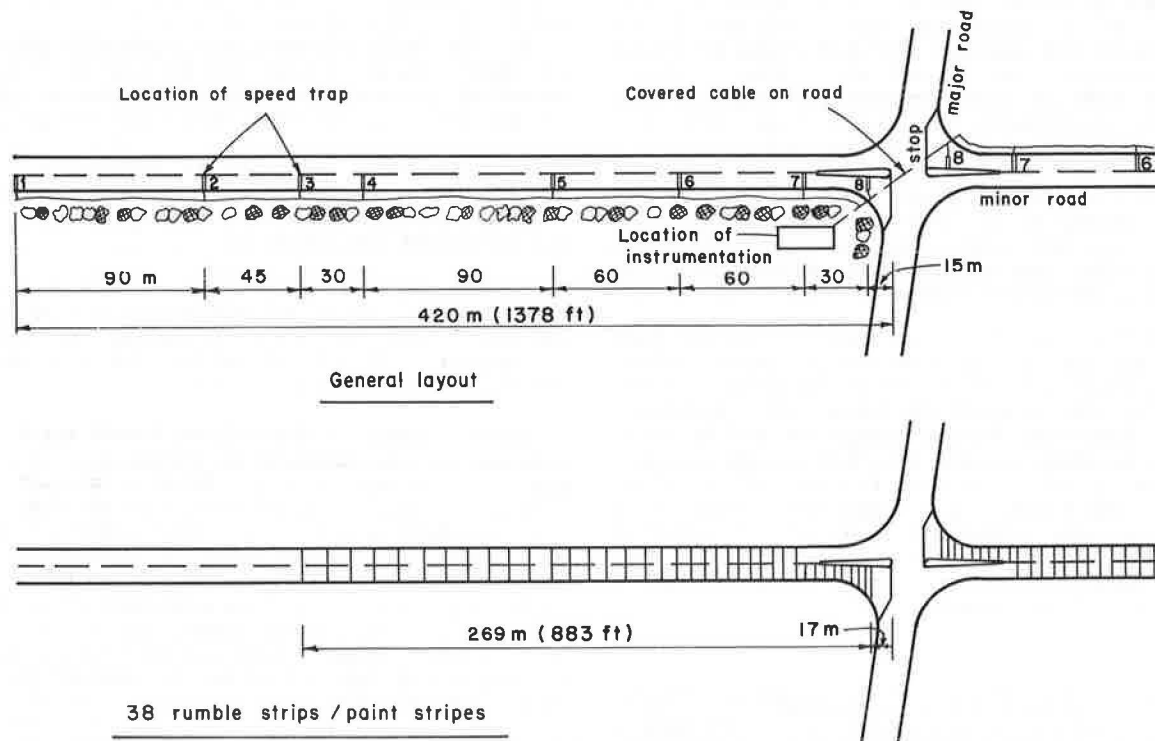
General view of intersection, layout of equipment, and arrangement of rumble strips or paint stripes.
